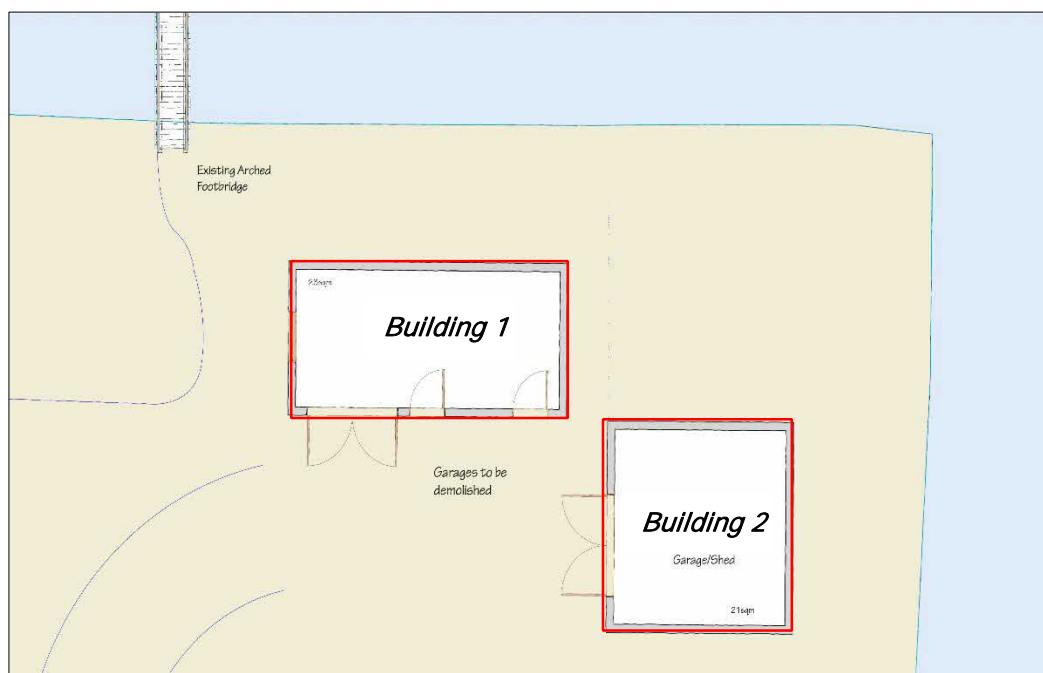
Building layout, taken from drawing number 20-070-002-A dated May 2020 provided by Hollins Architects
